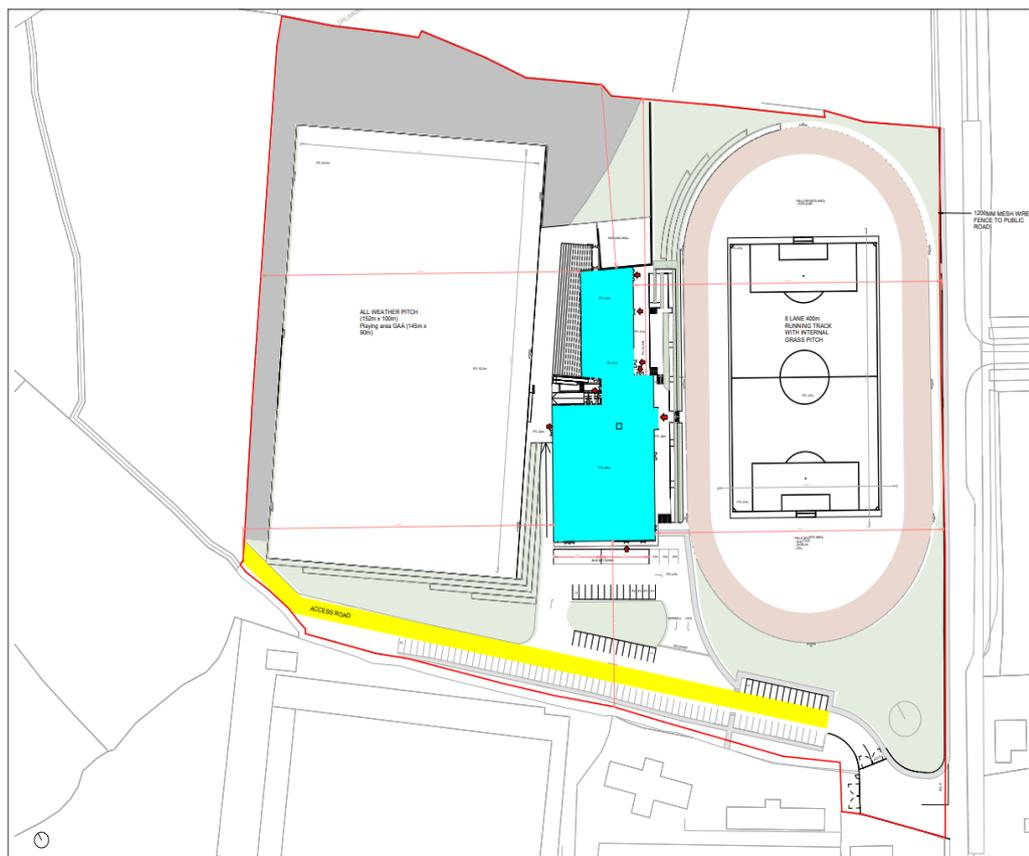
Extract from Planning Drawings (As Prepared by Collins Boyd Architects)
